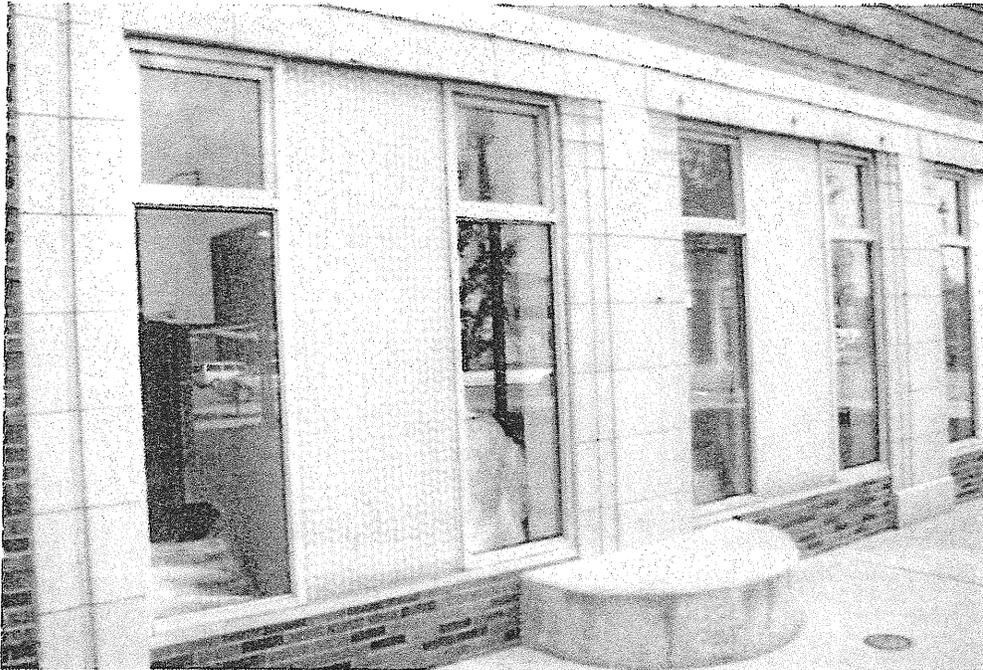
Detail of storefronts, showing infill and brick bulkhead modifications to window bays.
